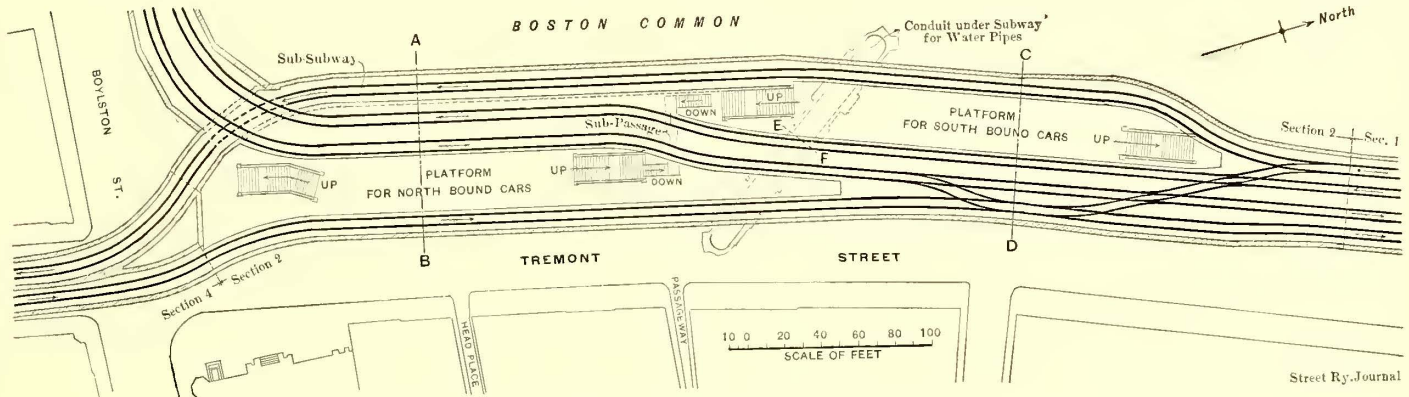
PLAN OF BOYLSTON STREET STATION
